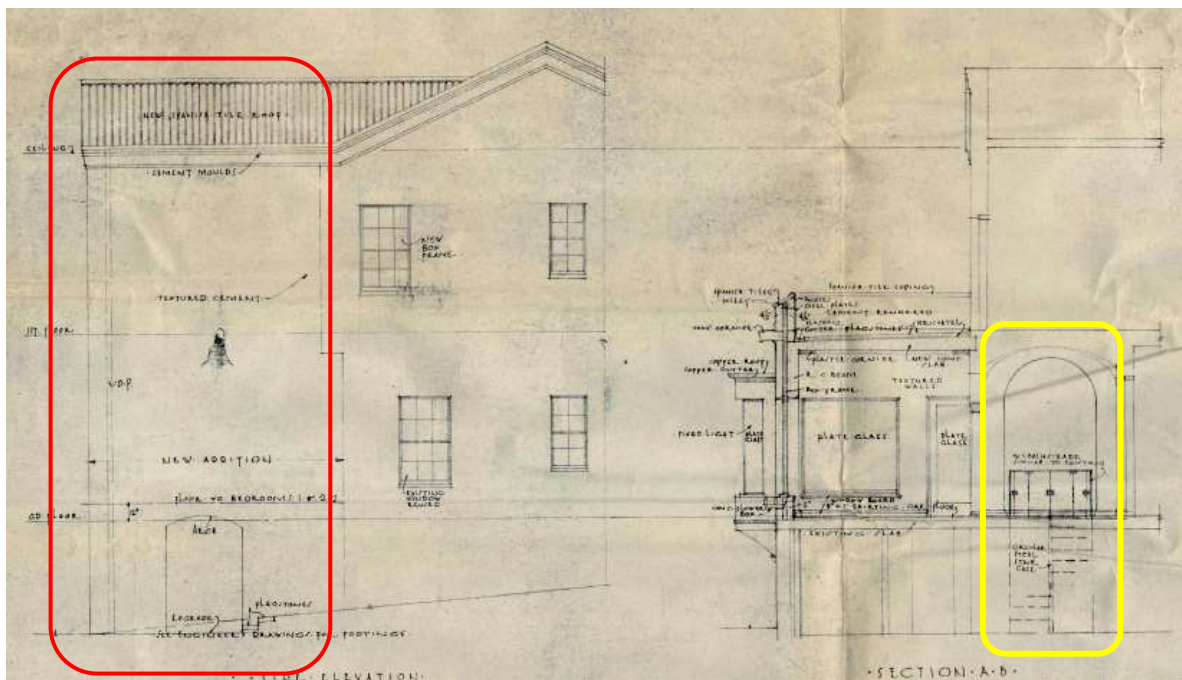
Elevation and section of the 1937 Dudley Ward scheme.
